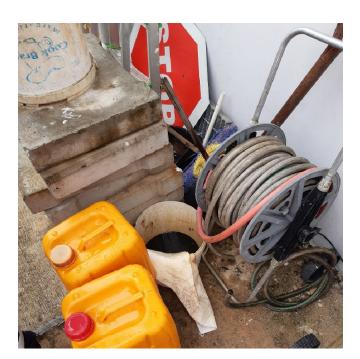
Poor housekeeping – open bucket of waste oil exposed to rainfall without secondary containment
